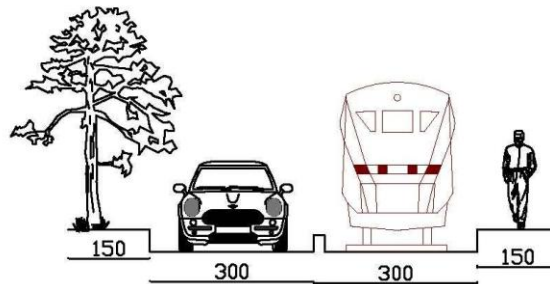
Section of Proposed Local Distributor (Deniz Piyade Street, Necati Taskin Street, Cengiz Topel Street, Yesil Deniz Street, and Canbulat Street)
